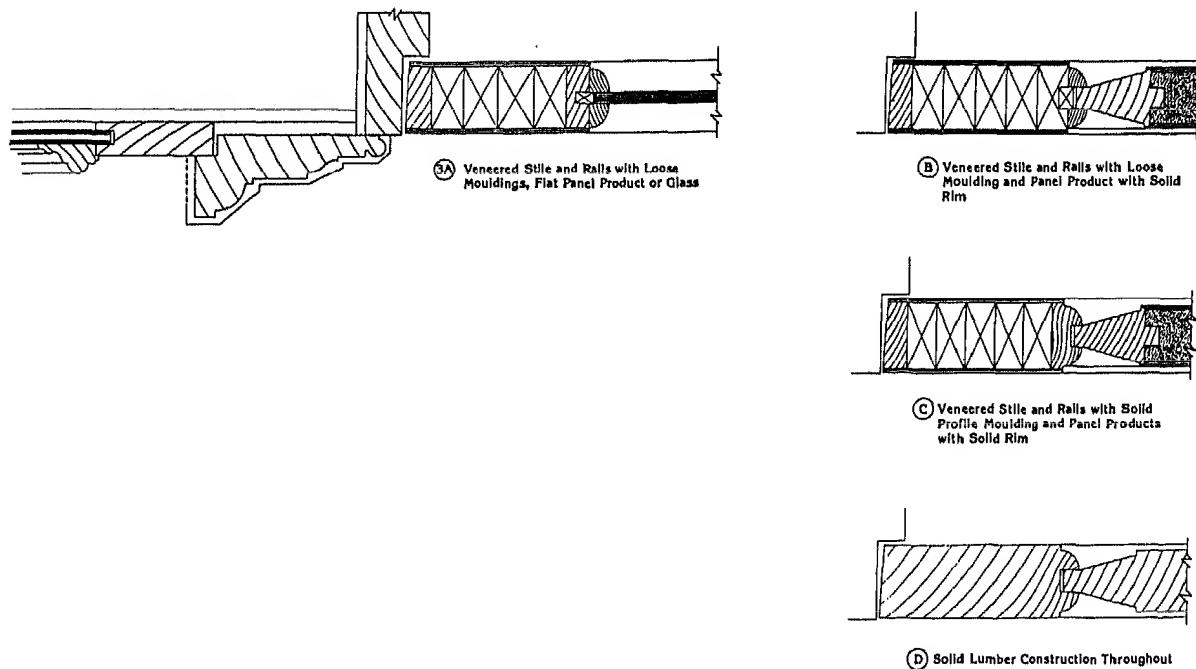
Paneled doors. Stile and rail doors designed to accent the adjacent wall paneling whether traditional or contemporary, or used alone, beautify an entryway or area.
